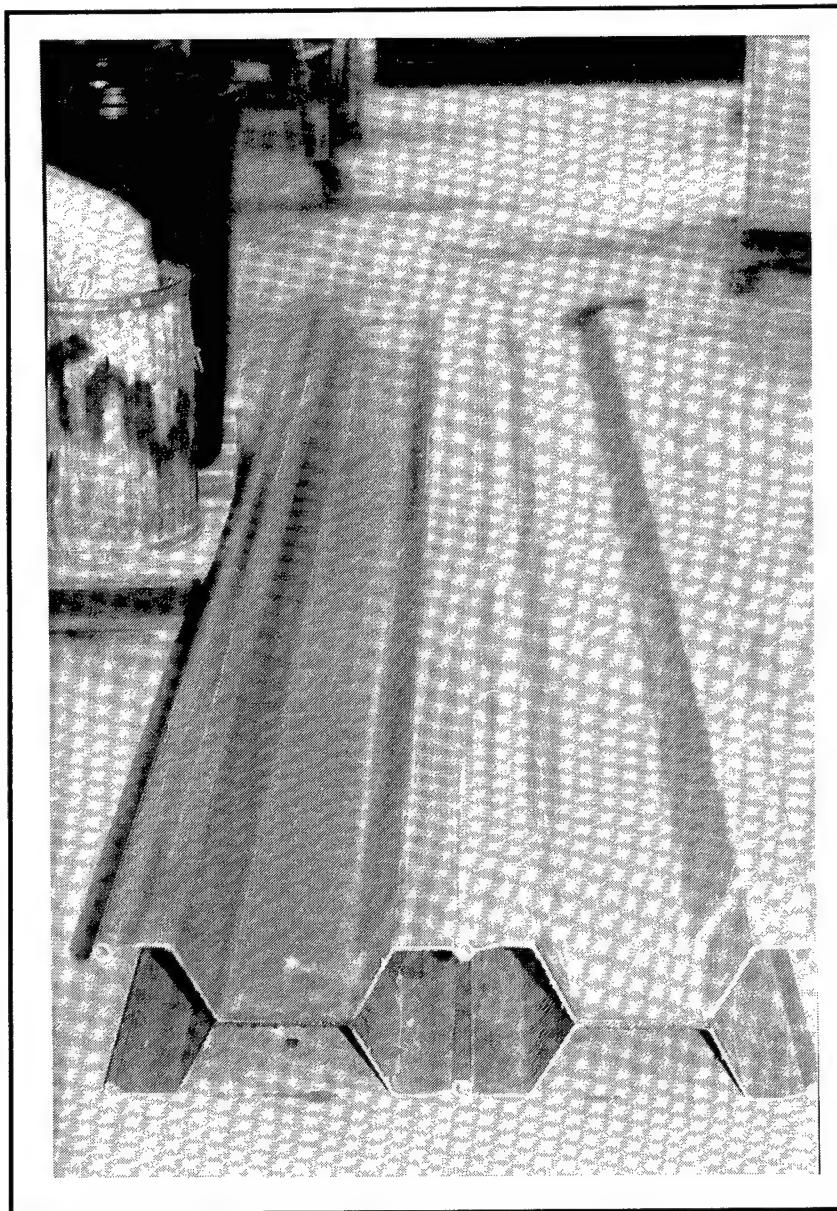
Honeycomb profile created by connecting sheet piling sections together.
